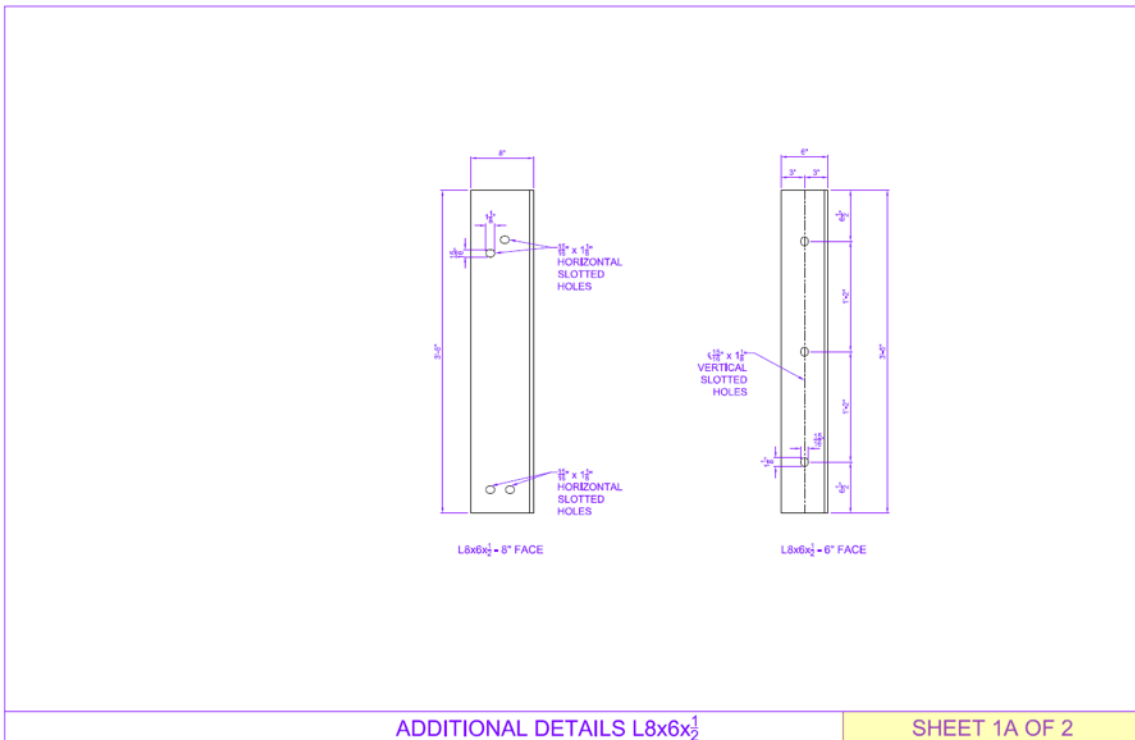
Engineering Drawing. fabricated k-frame replica (2 of 3)
